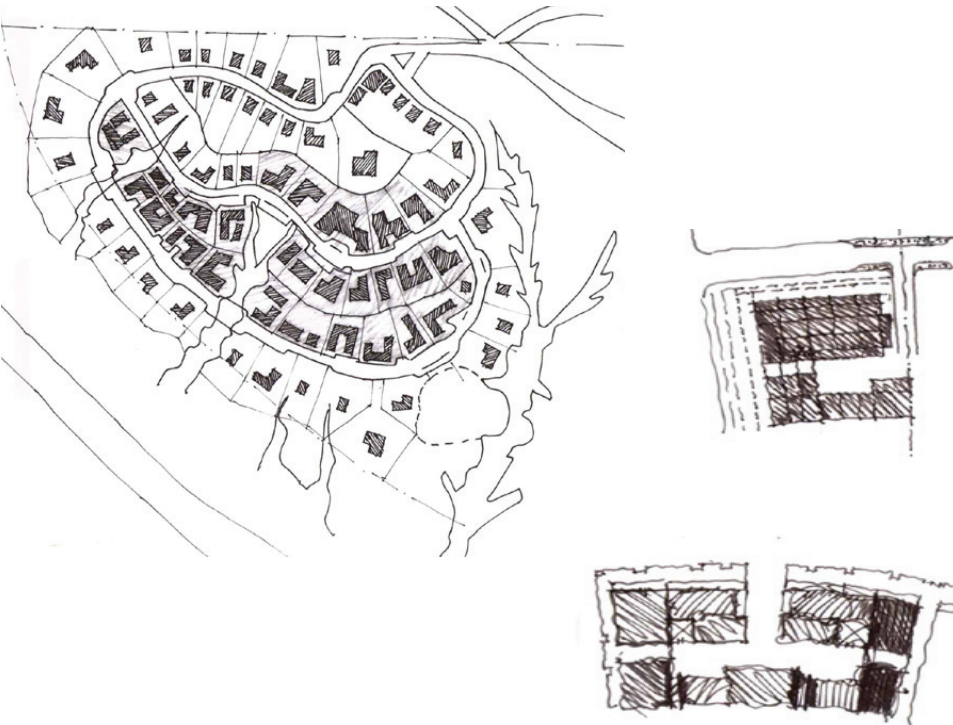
17: RESIDENTIAL - LOT PLAN DIAGRAM - STREET TYPE: SUB-COLLECTOR RESIDENTIAL
